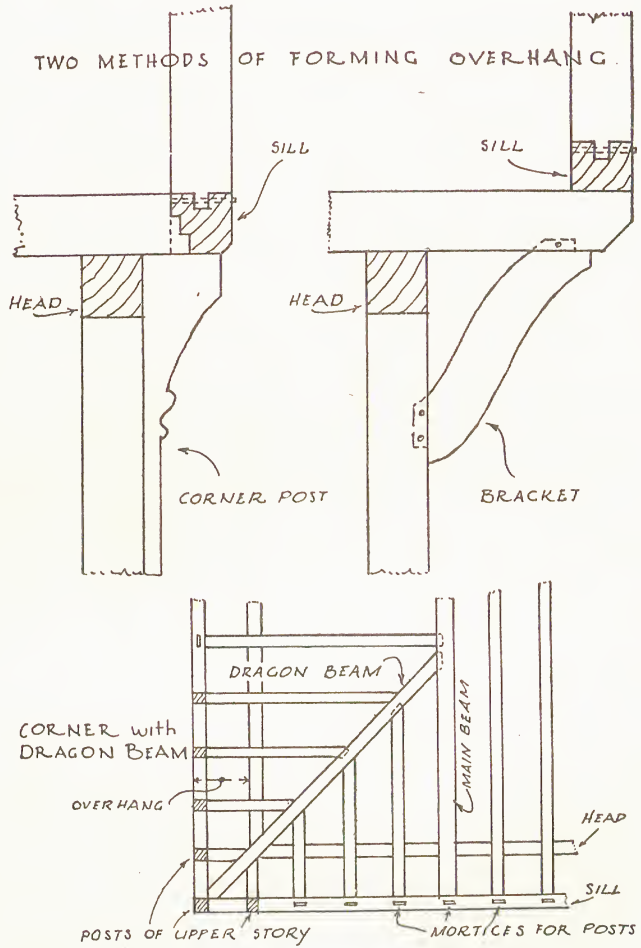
Overhanging floors in traditional timber-framed buildings.
